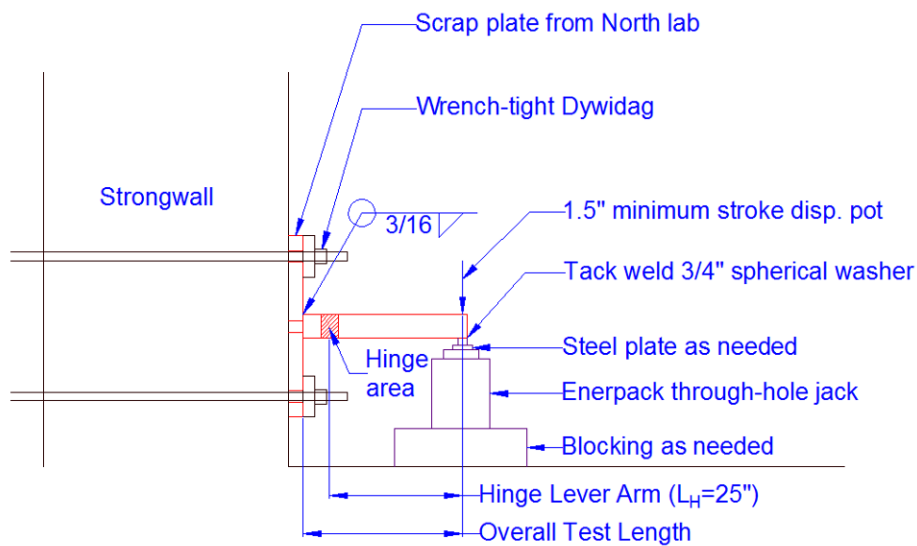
Setup for proof-of-concept beam and column hinge tests
